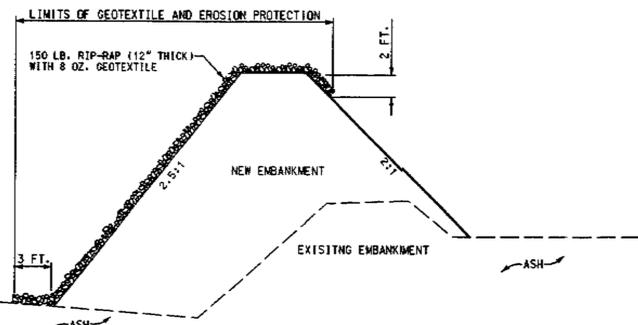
DETAIL OF NORTH END OF INTERMEDIATE EMBANKMENT
